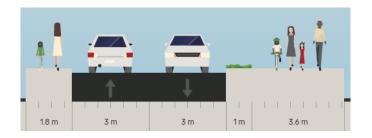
Slí Ógie Uí Dhufaigh street cross section
